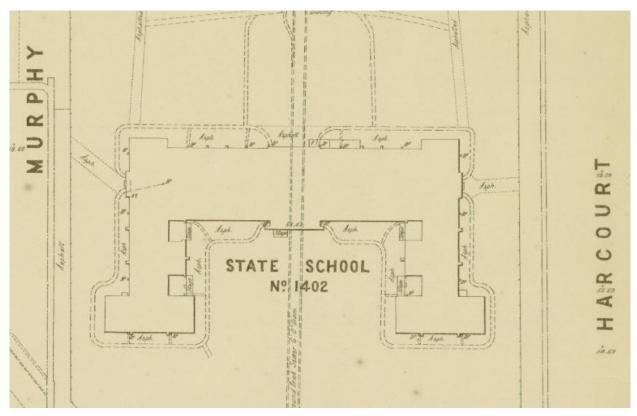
[Detail] MMBW detail plan no. 756, 1896 showing the Main Building
